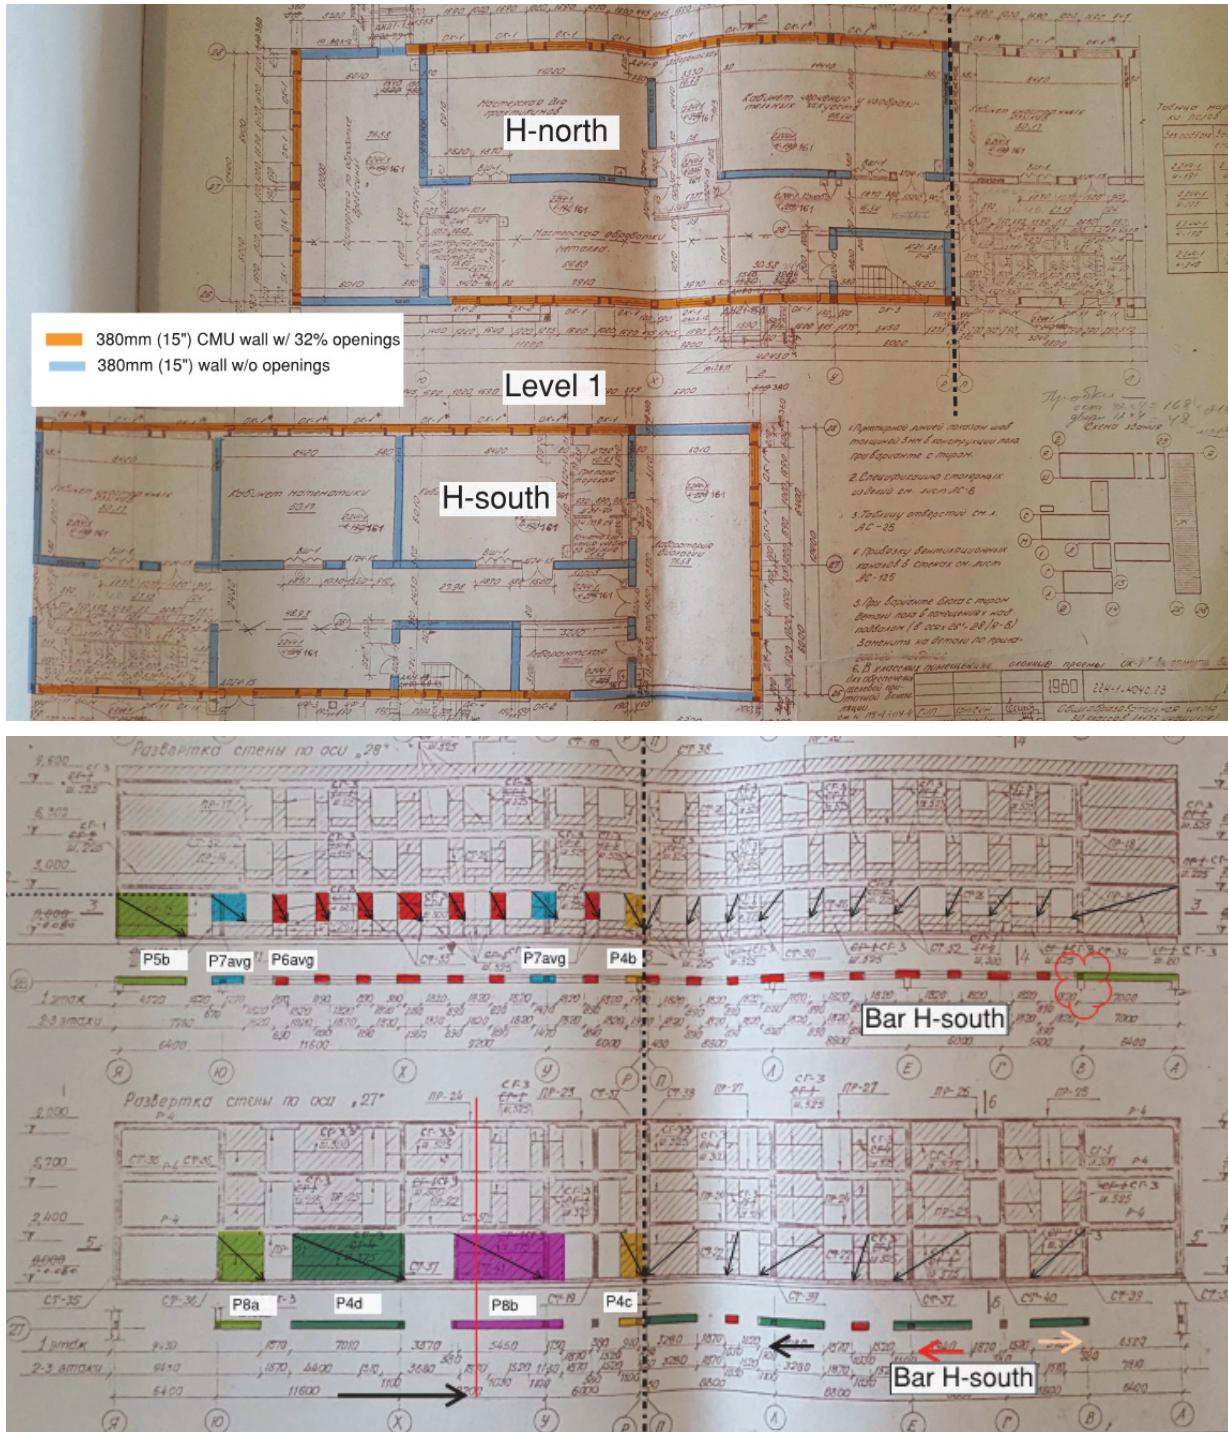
Map of structural piers and walls of CMCF index building that are assessed to determine the overall pushovers.
